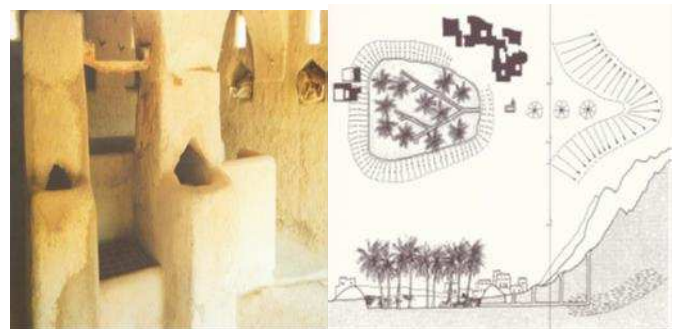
To the left; Ablution area Omani mosque, with falaj running underground. To the right; Schematic layout and section of a falaj showing the associated gardens which have been excavated down to the falaj level. [14] [15].
